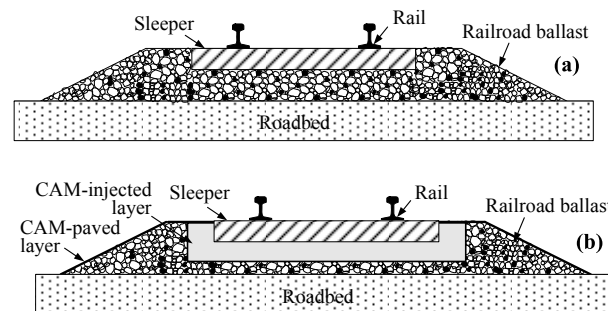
Ballasted track structure (cross-section, a: conventional ballasted track, b: grouted ballasted track)
